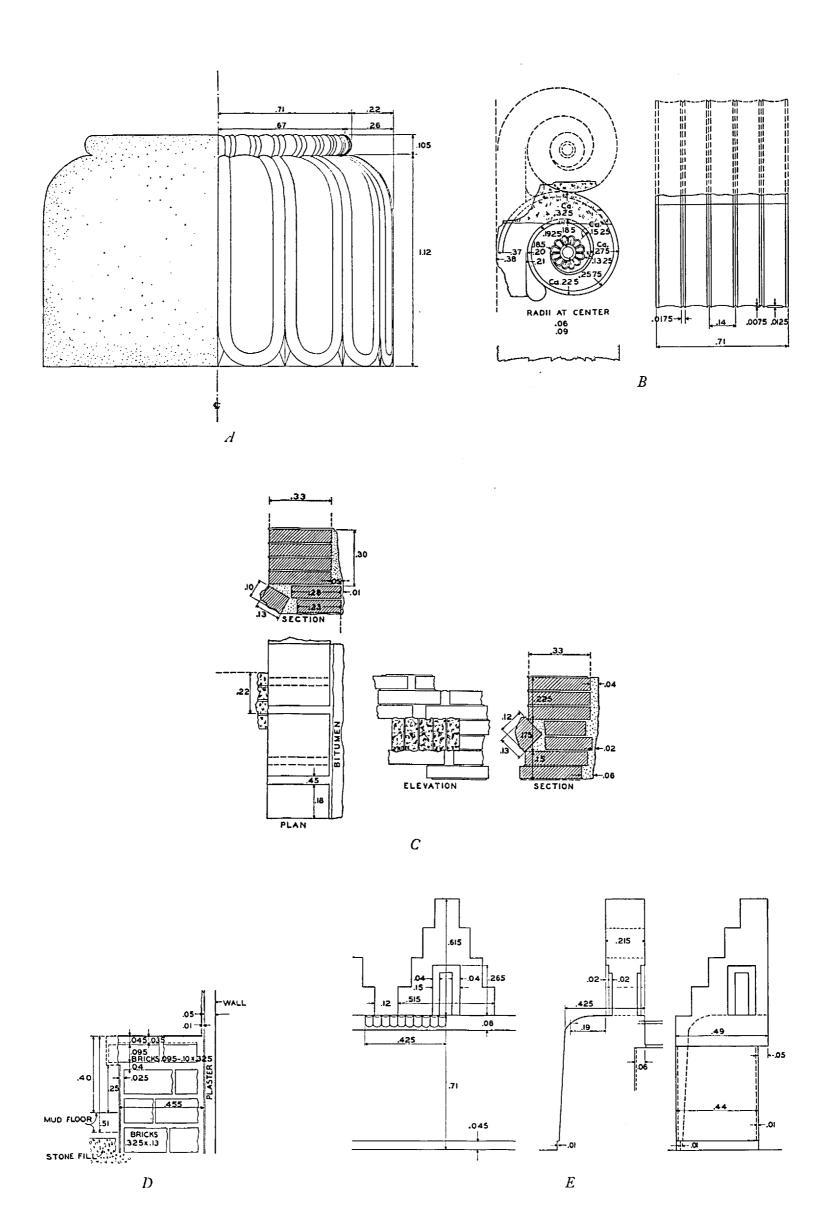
Apadana. Scale, 1:20. A-B. Drooping Leaf and Volute Units of Columns of Main Hall. C. Baked Bricks Laid in Bitumen in Eastern Portico. D. Bench of Unbaked Bricks in Eastern Portico. E. Stone Parapet of Eastern Portico. Front View, Section, and End View at Stair Head
